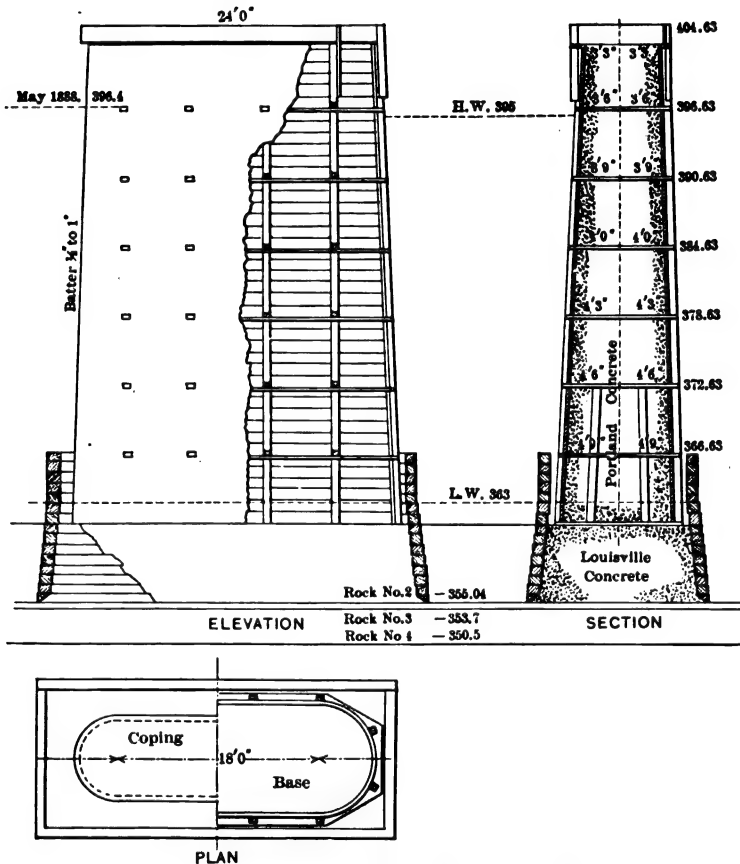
CONCRETE PIERS, RED RIVER BRIDGE.
